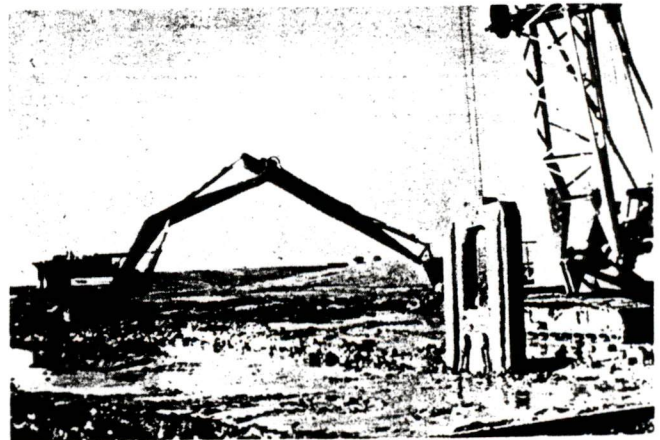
Equipment used for excavating deep slurry trenches includes a free-hanging clamshell and a modified backhoe capable of excavating to 52 ft. Braidwood Nuclear Power Station, Ill.
